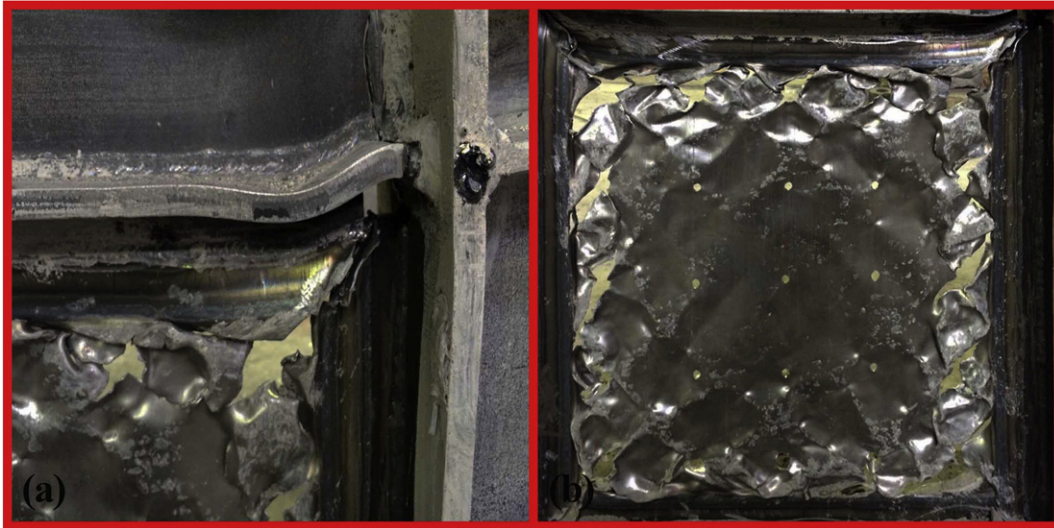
Specimen C-SPSW-DL (a) the fracture of right beam-to-column connection (b) back view.
